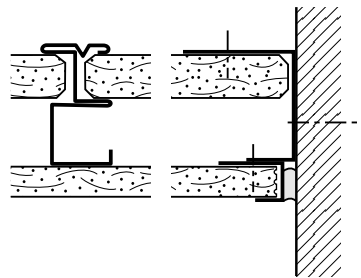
Construction of typical USG Horizontal Shaft Wall System for 1-hr. corridor or stair soffit fire rating.
